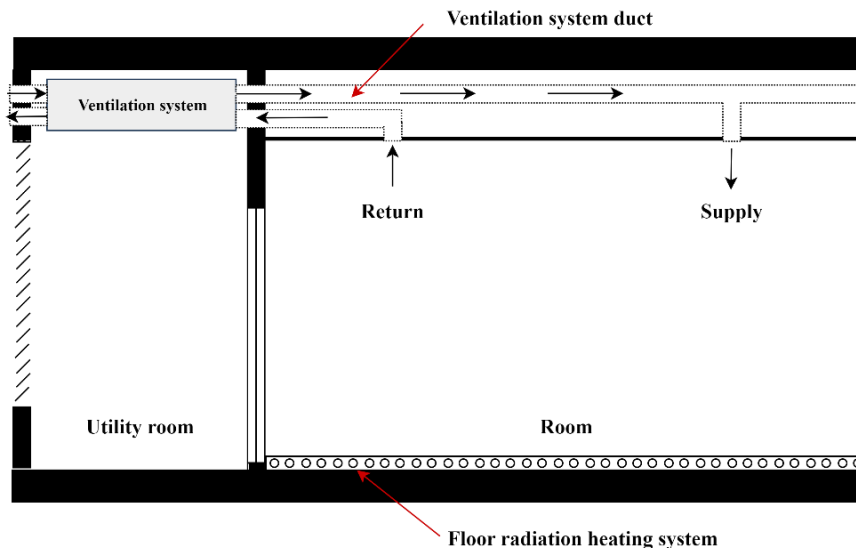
Diagram of a typical unit in a multi-unit residential building
